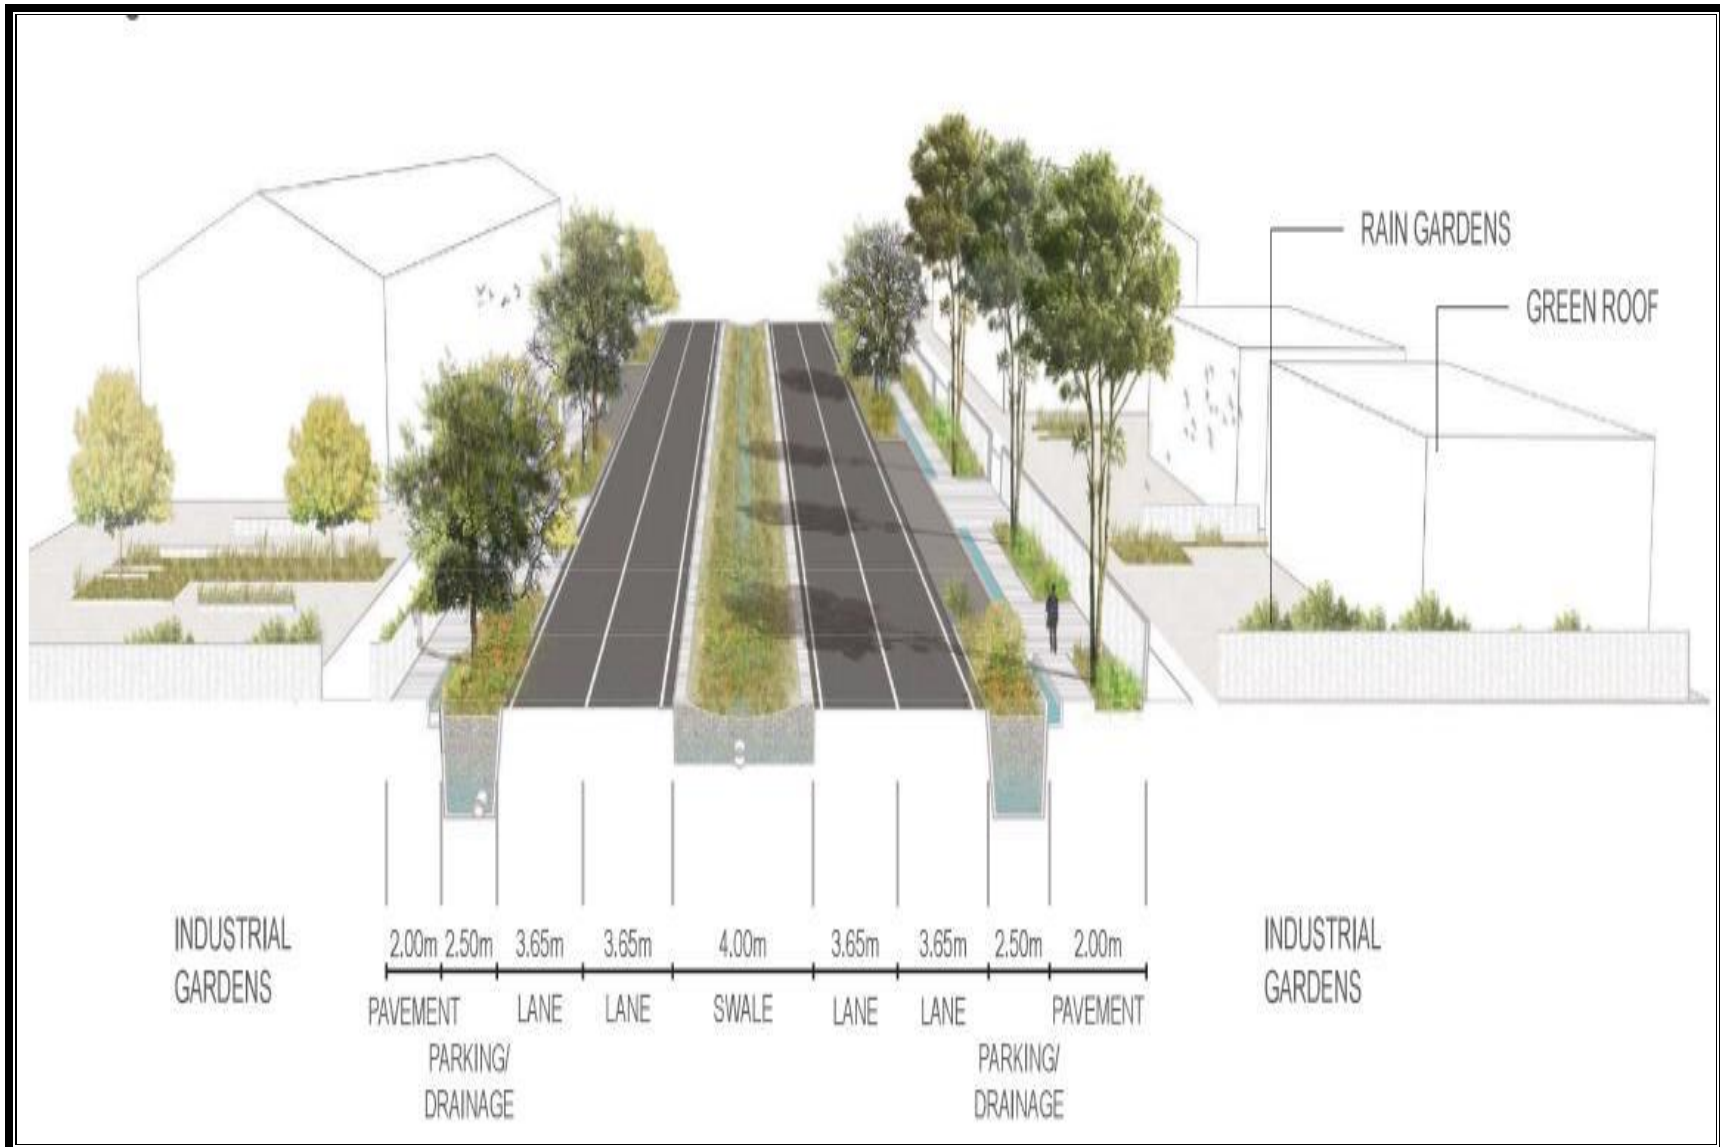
Section through a Typical Collector Road showing Street Drainage Channels
